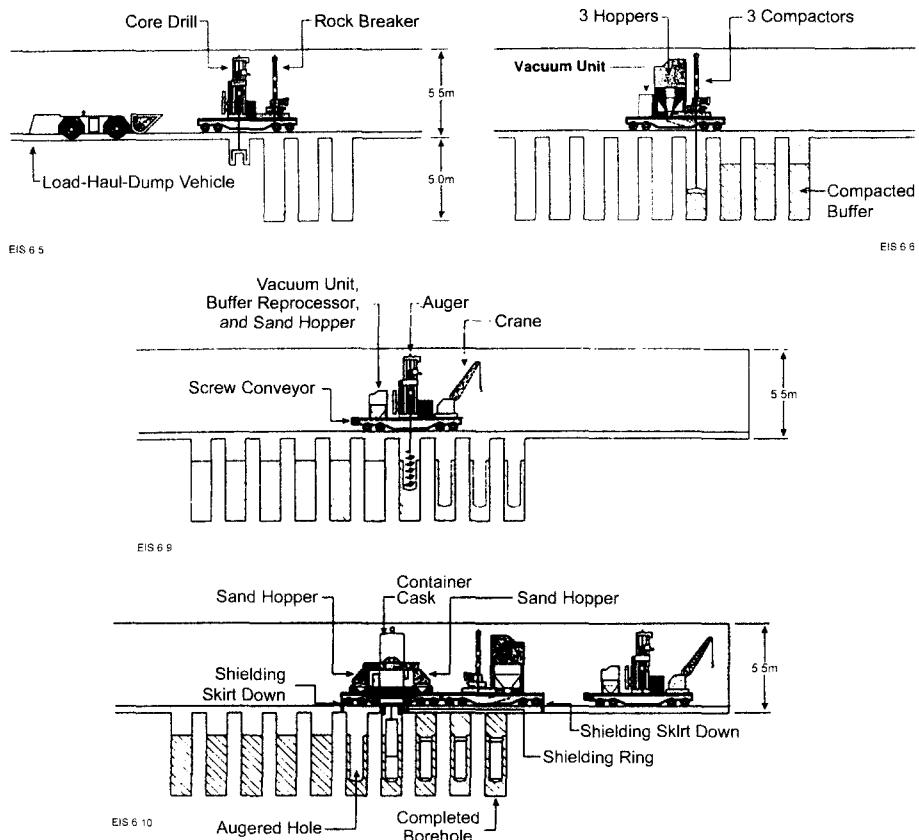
Concept of deposition hole drilling, buffering and emplacement of a canister
